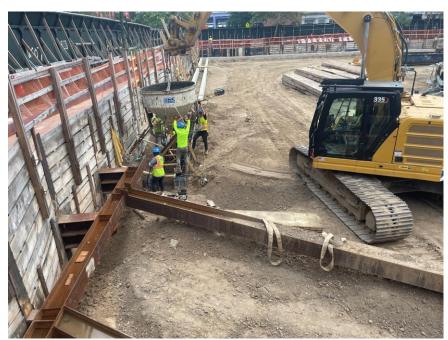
ECD pouring concrete into the previously installed wooden formwork in the eastern part of the site (facing south)
